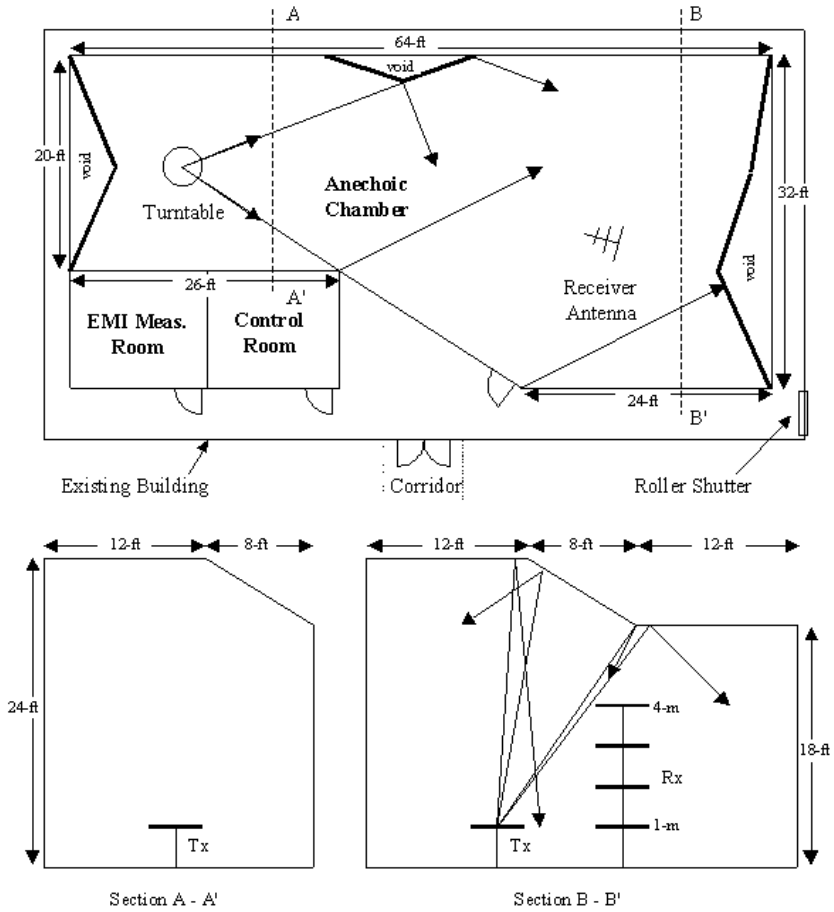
Floor plan and cross-sectional views of the asymmetrical-shaped chamber.
